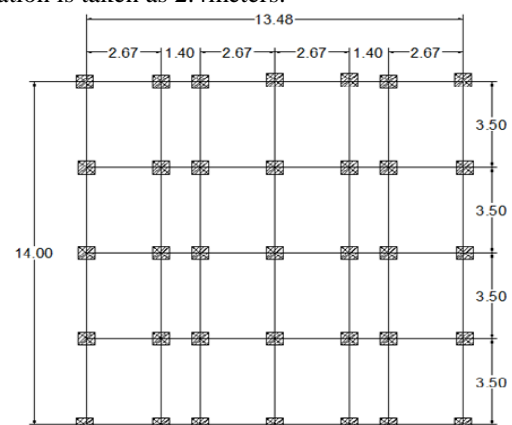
Plan of the building used for analysis purpose with is column orientation
